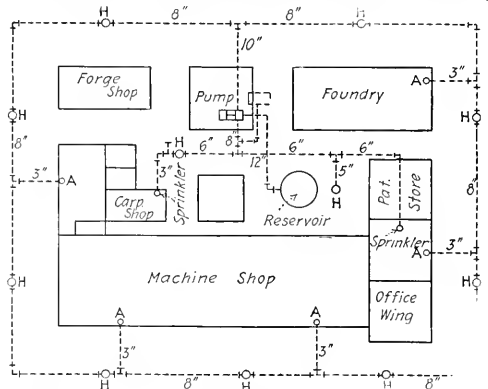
LAYOUT OF HYDRANTS AND OUTSIDE PIPING
